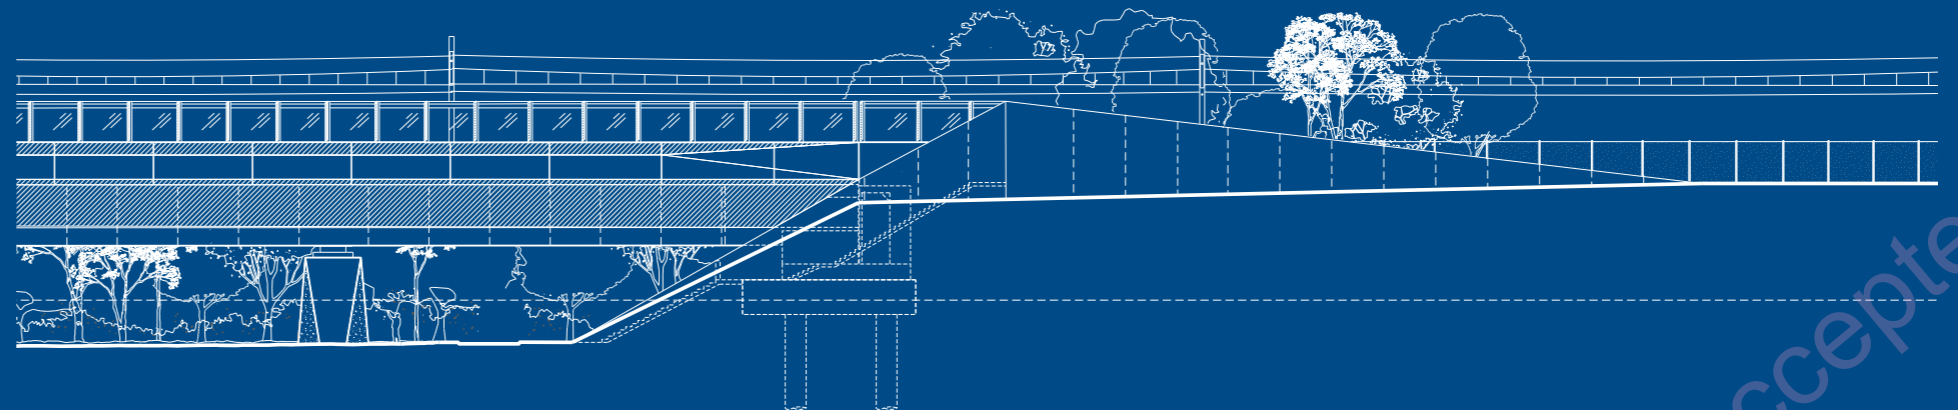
\_ Proposed south elevation - South abutments and approach embankments
